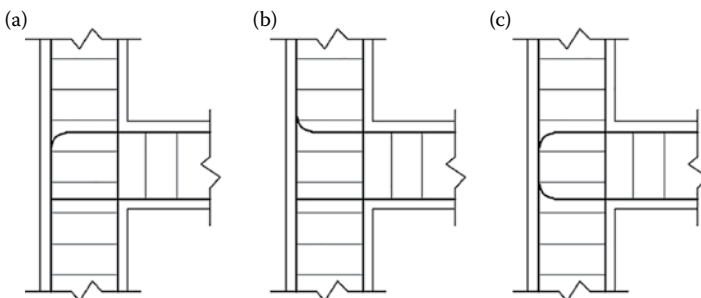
Reinforcement details for exterior beam column connection: (a) beam bars bent down into the column, (b) beam bars bent up into the column, and (c) “U” bar detail.
